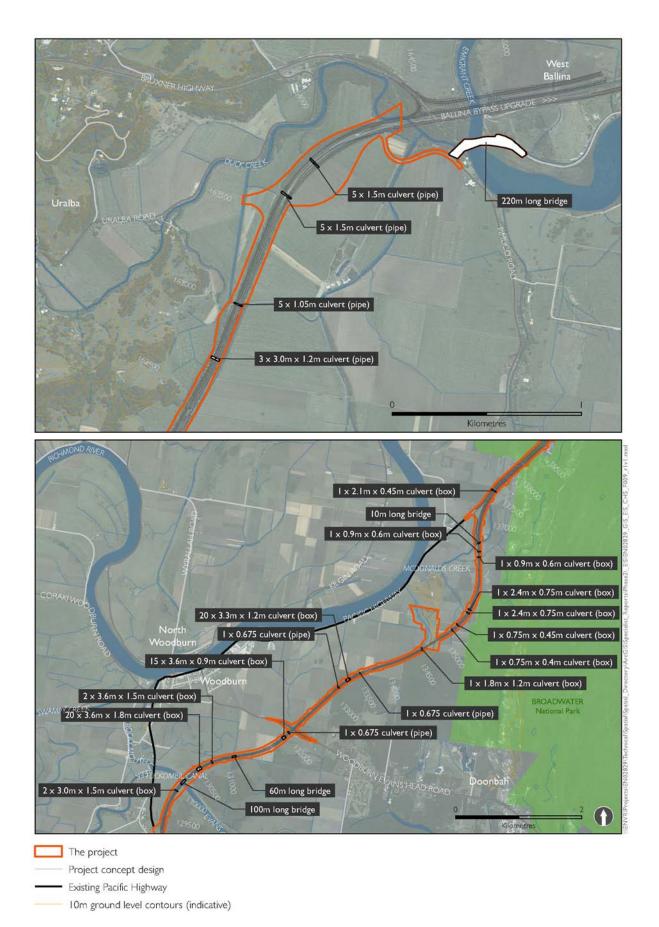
Location of typical flood relief structures- Richmond River floodplain
